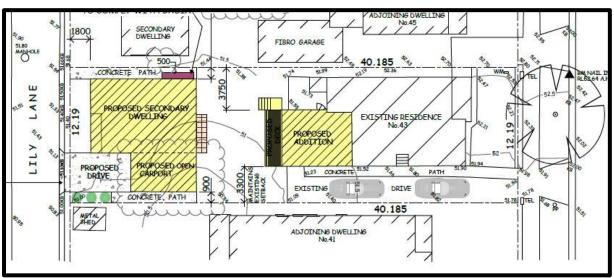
Proposed site plan (Source: NKDrafting 2020).
